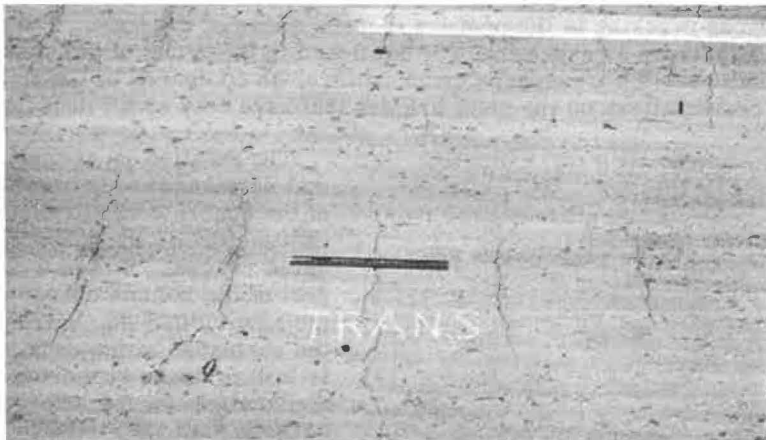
Transverse cracks over trussed reinforcing bars.
